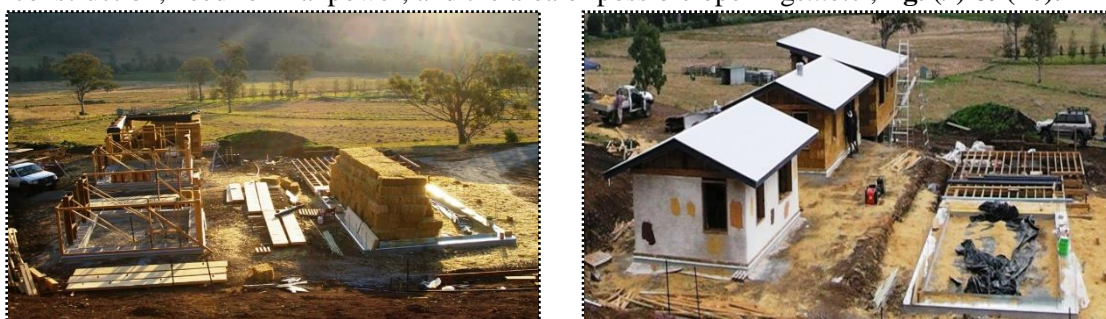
& (10): Construction with rice straw (Source: [14]).
